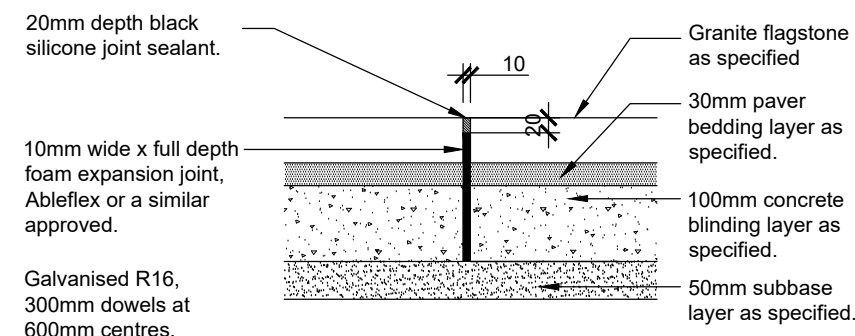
Typical Joint Layout on Crossing - Full Granite Treatment
